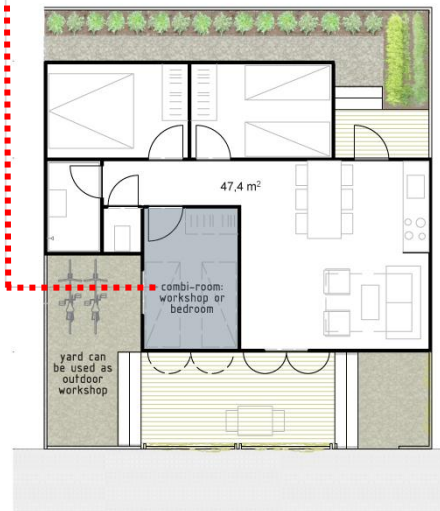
Haiti House 37- Type 02 (Source: <http://www.archdaily.com/tag/haiti/>)
